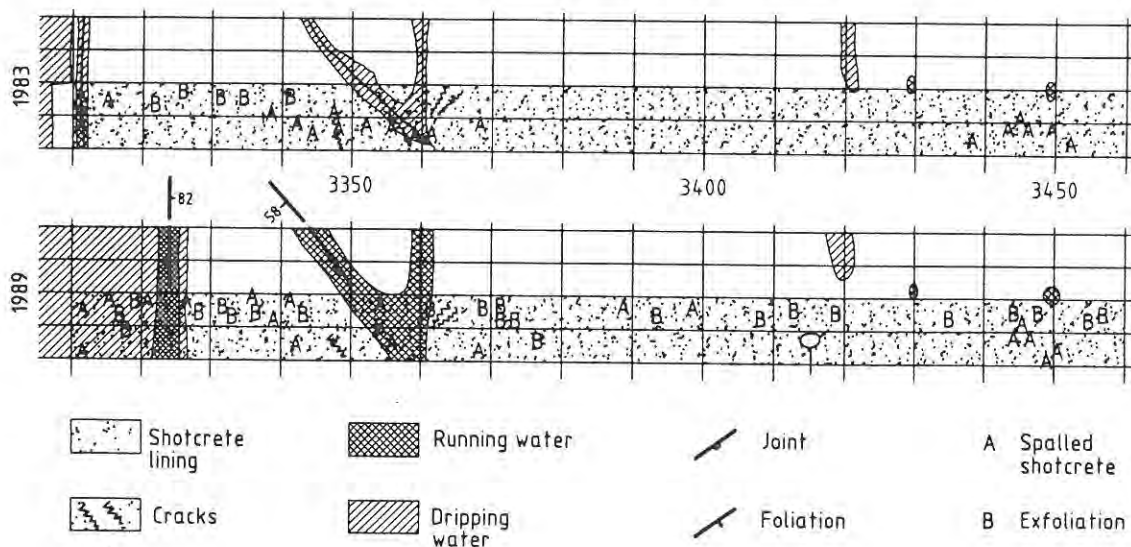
Surveys of 1982 and 1989 show propagation of shotcrete spalling off in the Heggura tunnel
